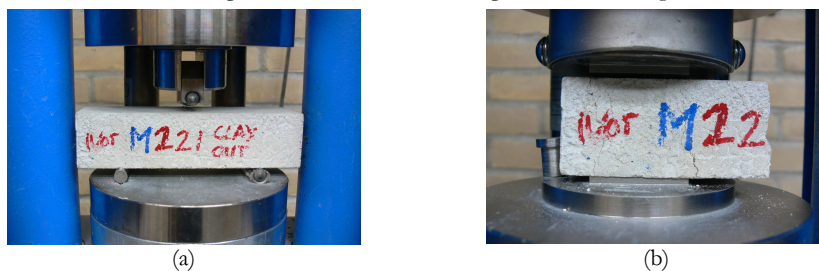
Test on mortar bars: (a) three-point bending test; (b) compression test.
